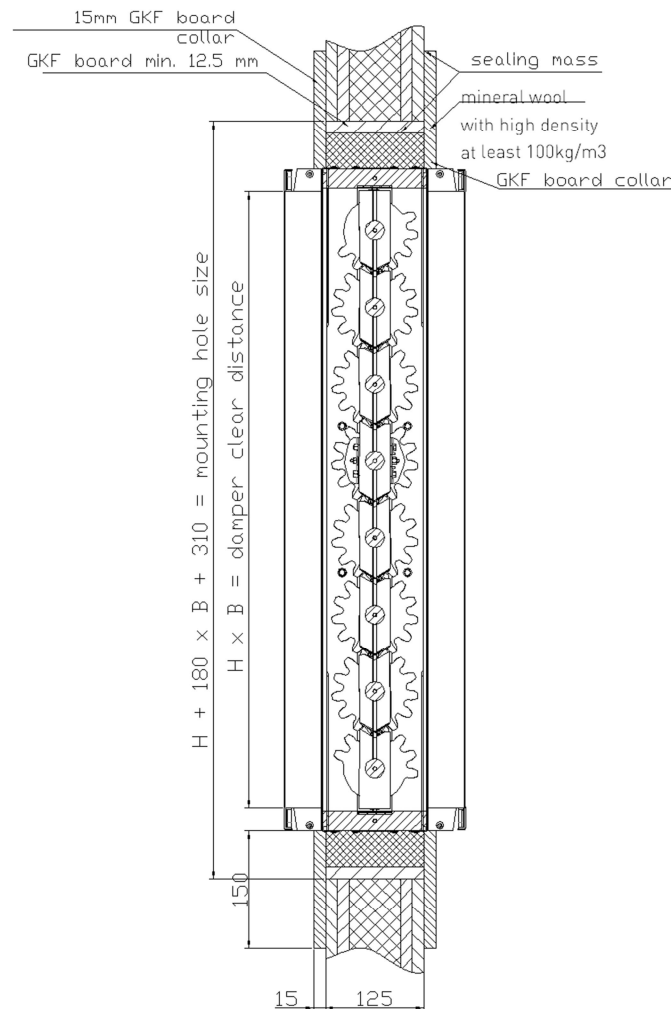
Installation method of fire dampers WKP-P in flexible wall with 125 mm thick
